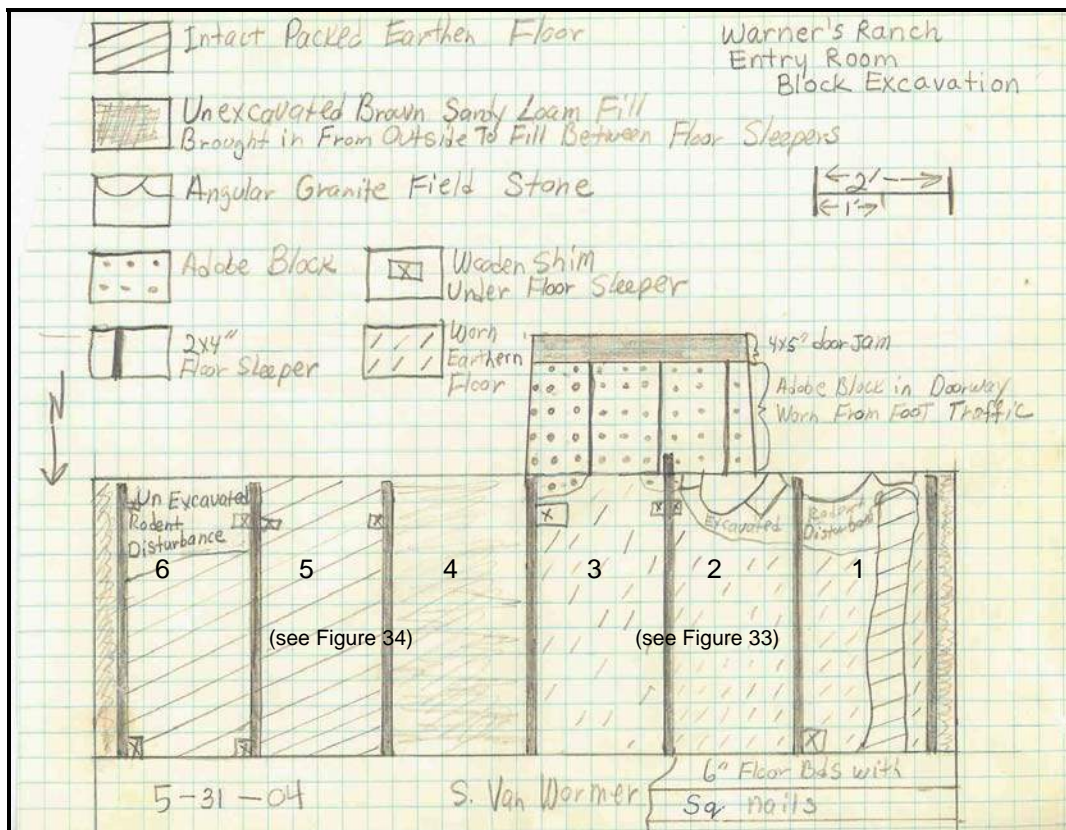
Plan view of Entry Room (101) block excavation prior to excavation of the corner units. Except for Section 4, which was not excavated, only the loose sandy loam fill between the sleepers has been removed. The cobbles at the west end of the south wall were exposed by rodent burrowing.
